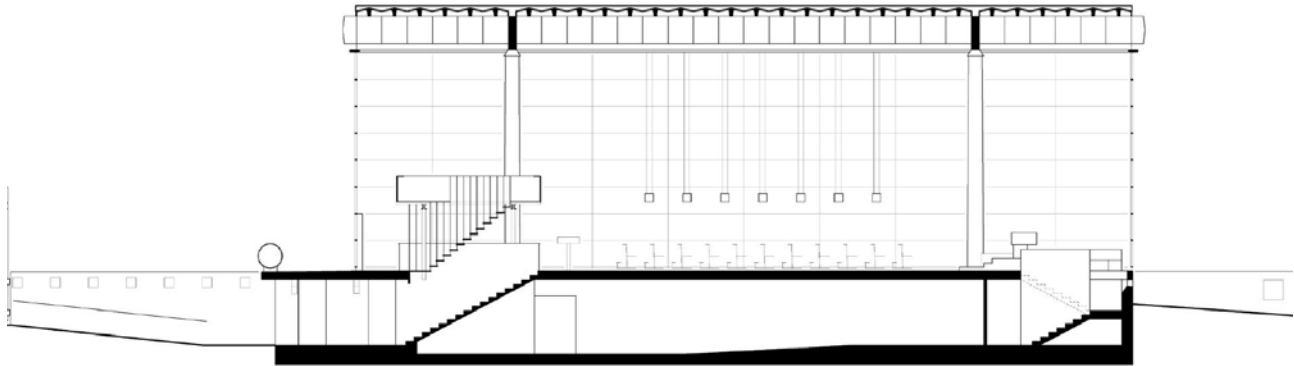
Longitudinal section. describing the arrangement of spaces (courtesy of SGB architectti)
